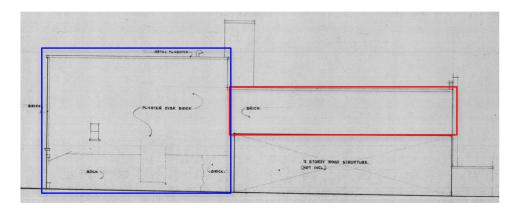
Detail of a 1977 illustration, showing no windows along the southern face of the brick warehouse (red).⁸⁴
